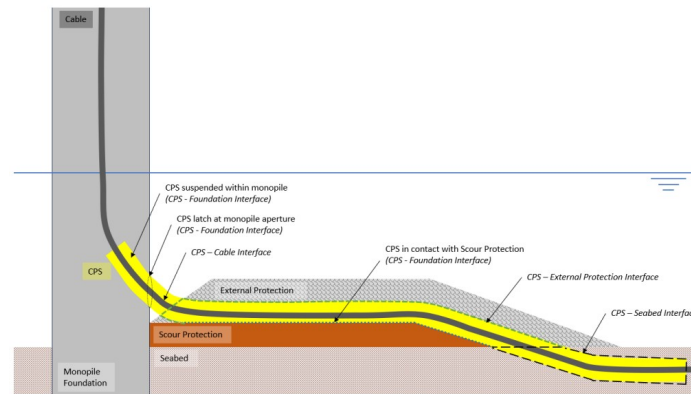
Typical cable burial and protection layout for monopile foundations (The Carbon Trust, 2021).
